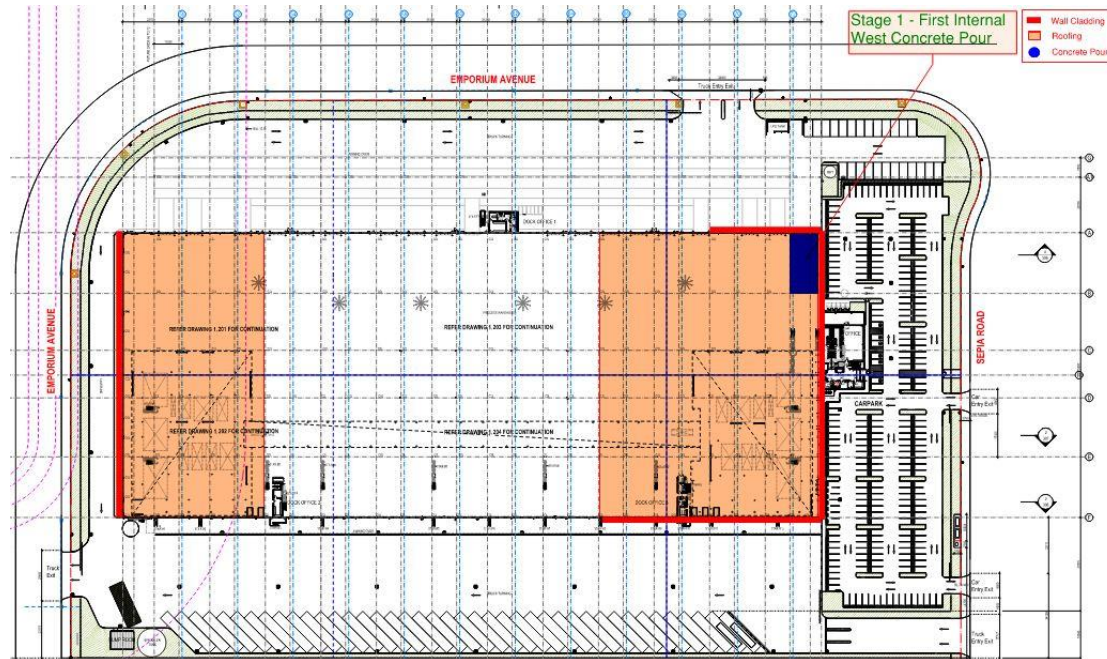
to 2.5 show the four key stages of the warehouse development as provided by RCC.
